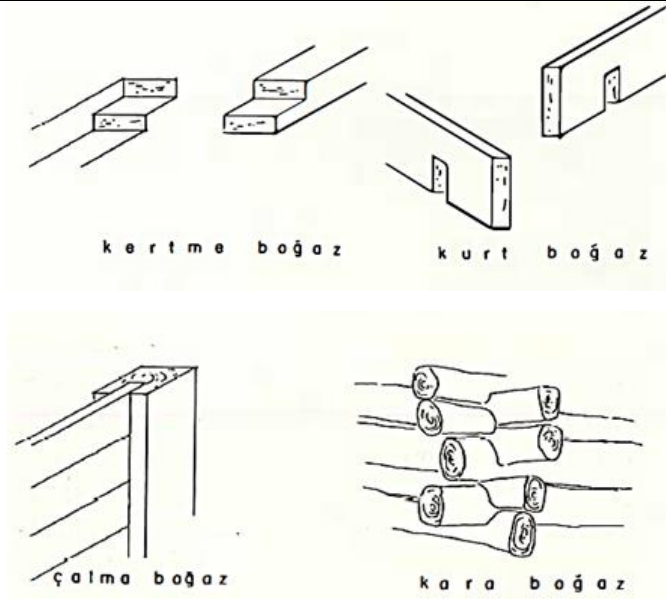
Joint Systems in Wooden Masonry Buildings (Özgüner, 1970)
